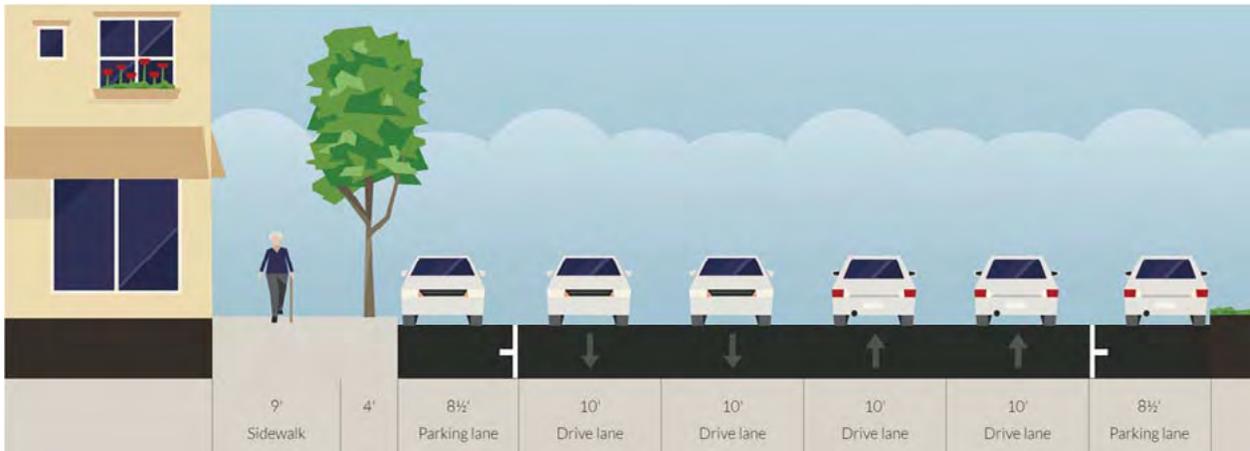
EXISTING SECTION OF GREEN BAY ROAD (SPRUCE – ELM)
